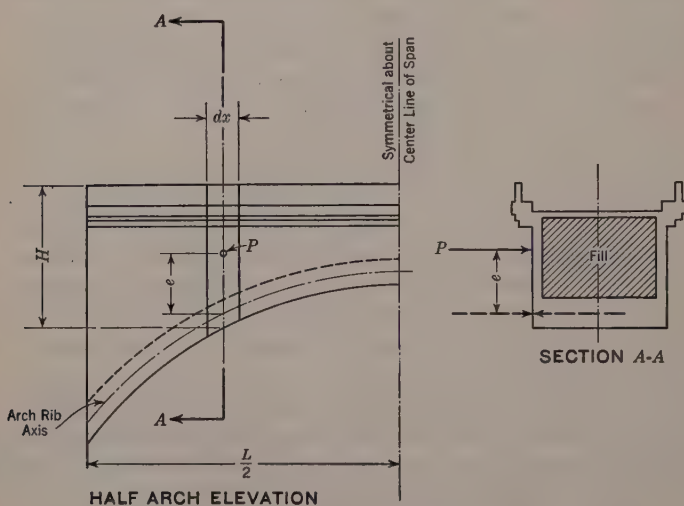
SPANDREL FILLED ARCH BRIDGE.
